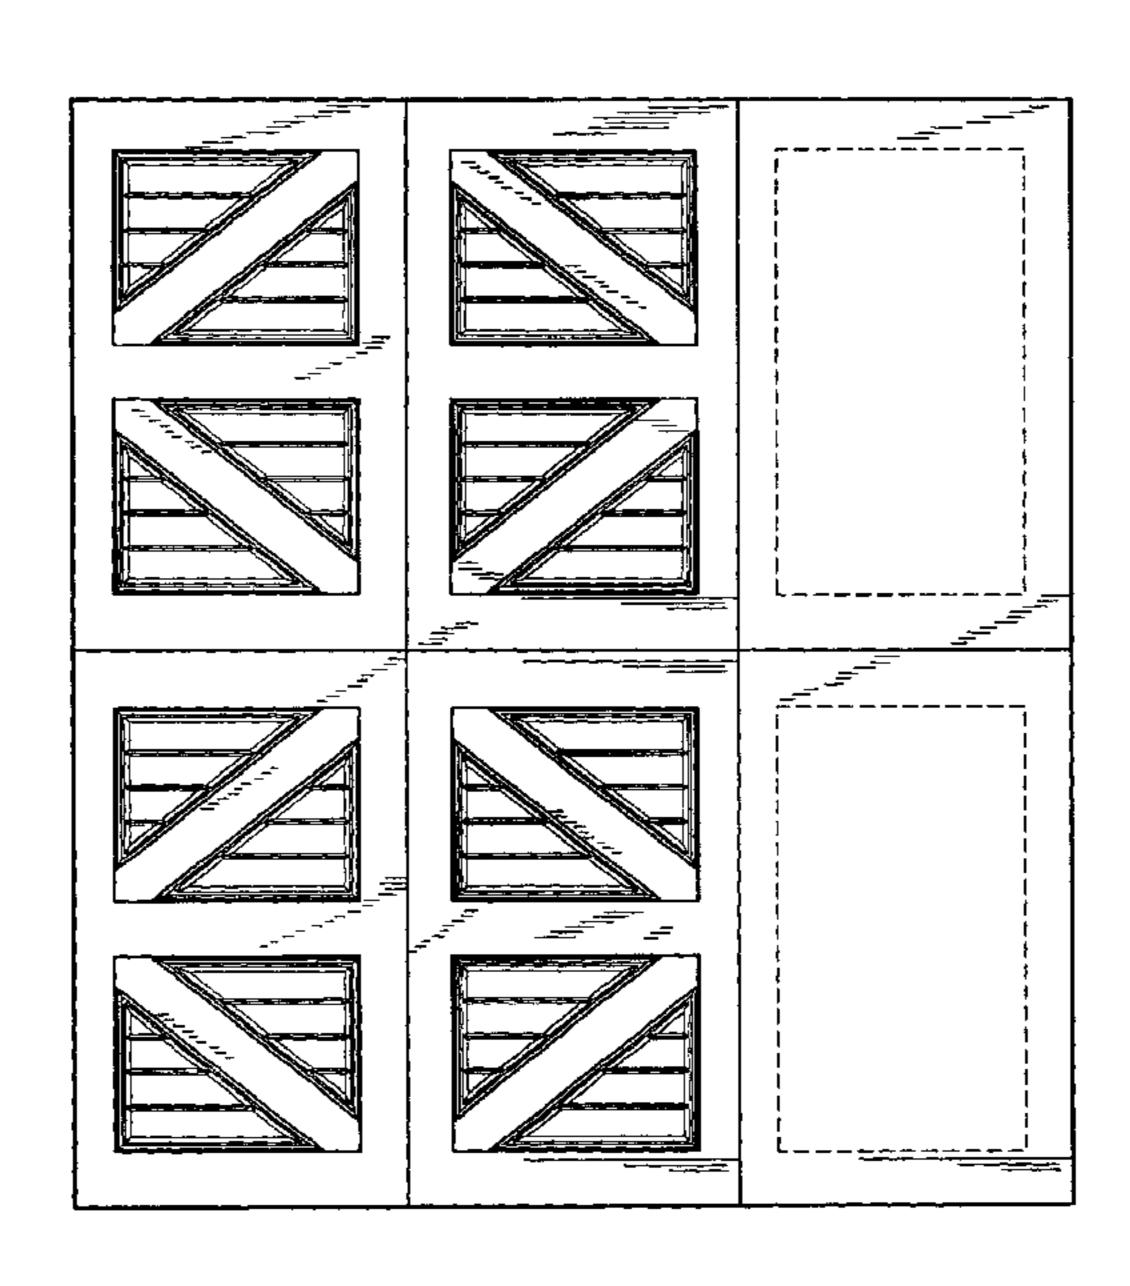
is a front elevation view of a sectional overhead door according to my new design; and,
